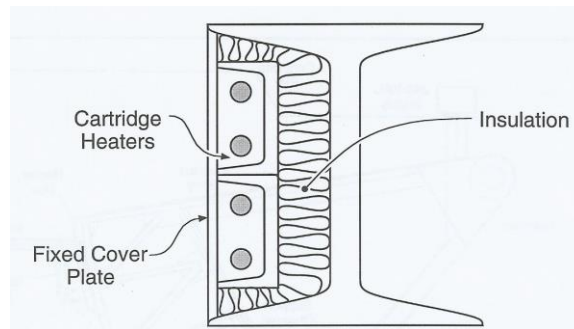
Heater construction for a trunion arm. The heater cover plate faces the pier wall (after Haynes et al., 1997).
